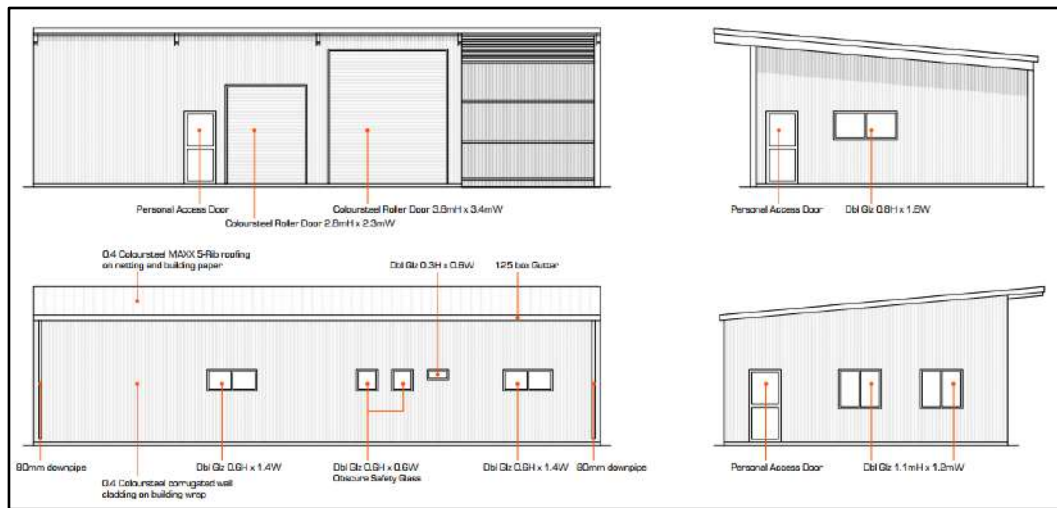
External elevations of the proposed shed (Source: Sheds4U).
